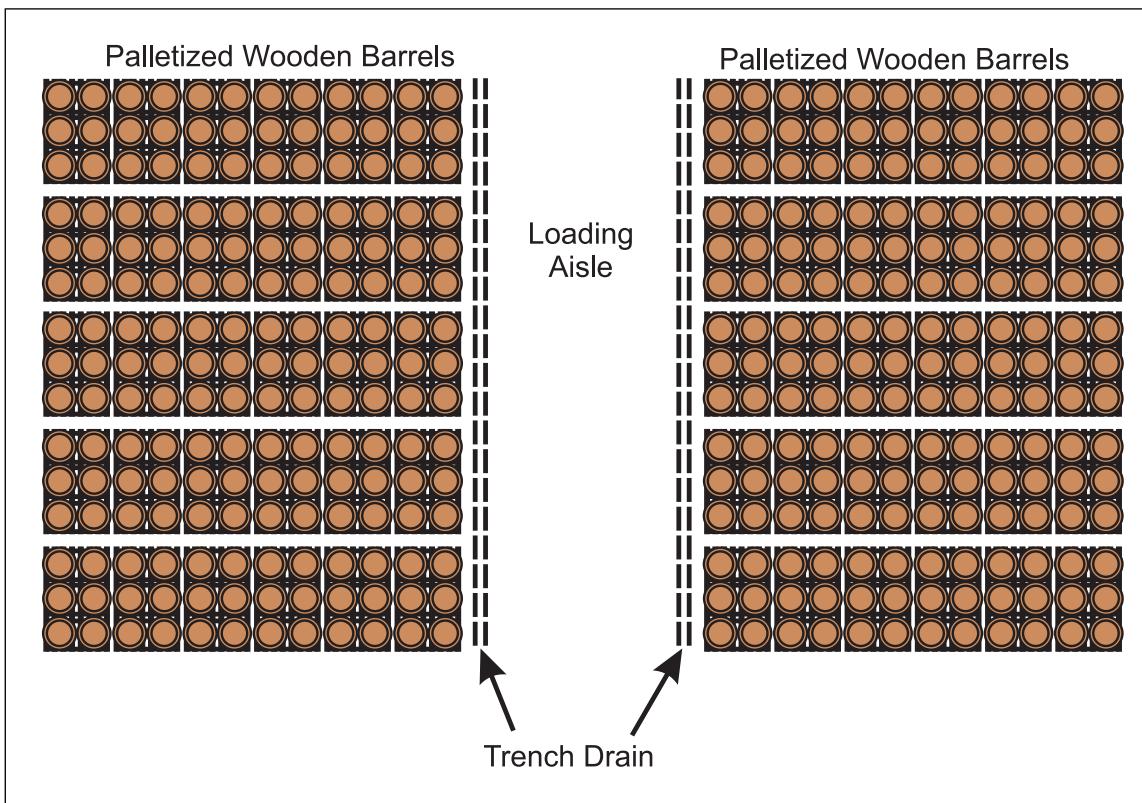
B. Loading aisle trench drain arrangement (plan view)
